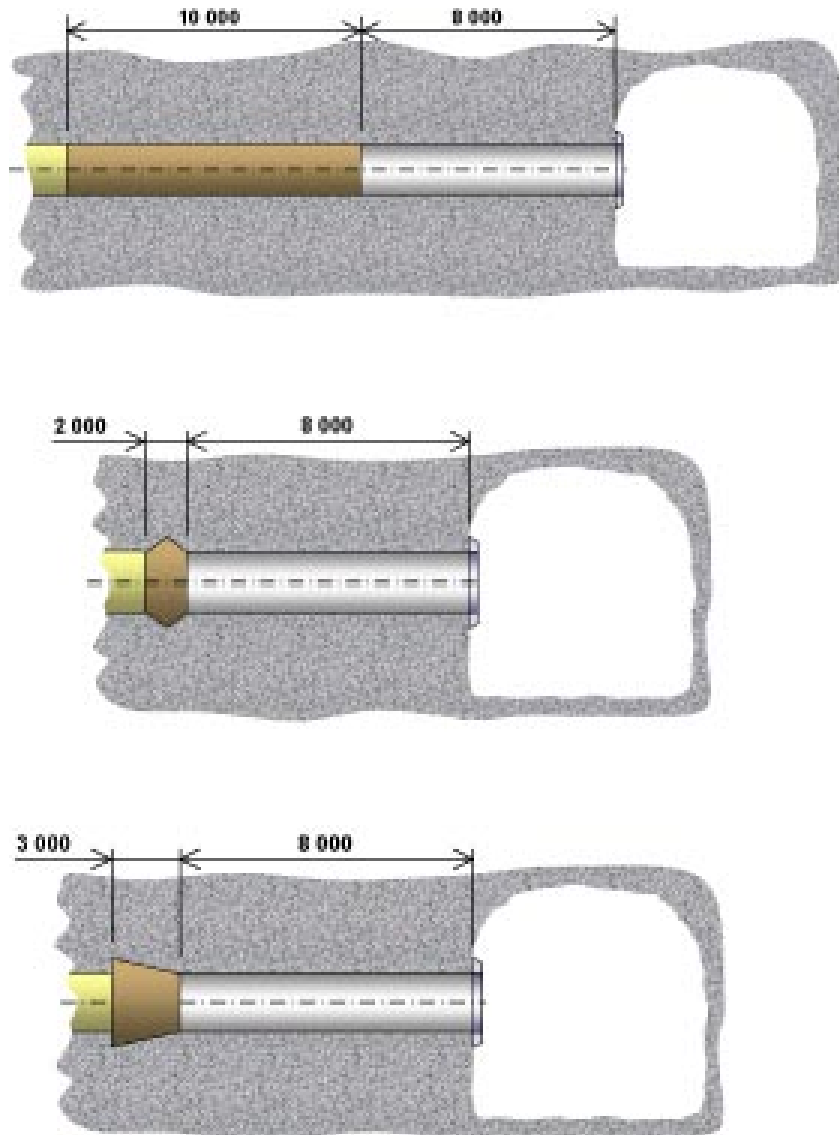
Concrete plug alternatives: Friction plug (top) similar to shotcrete plug, Steel-reinforced plug positioned in a notch (middle) and steel-reinforced plug positioned in a notch (above) /Thorsager and Lindgren, 2004/.
